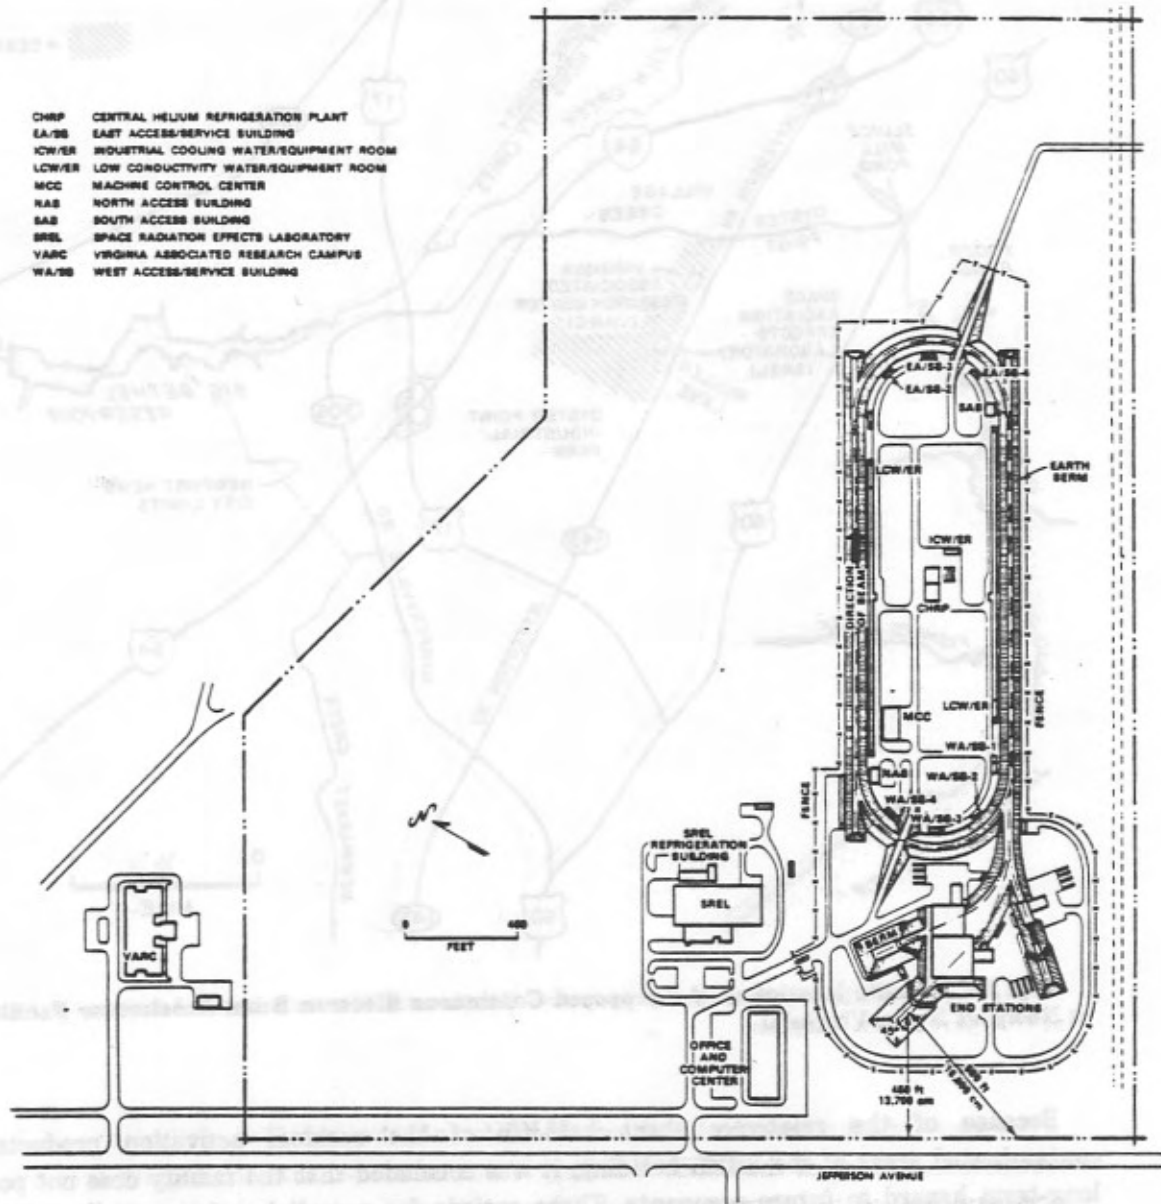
Proposed site layout for the Continuous Electron Beam Accelerator Facility at Newport News, Virginia.
